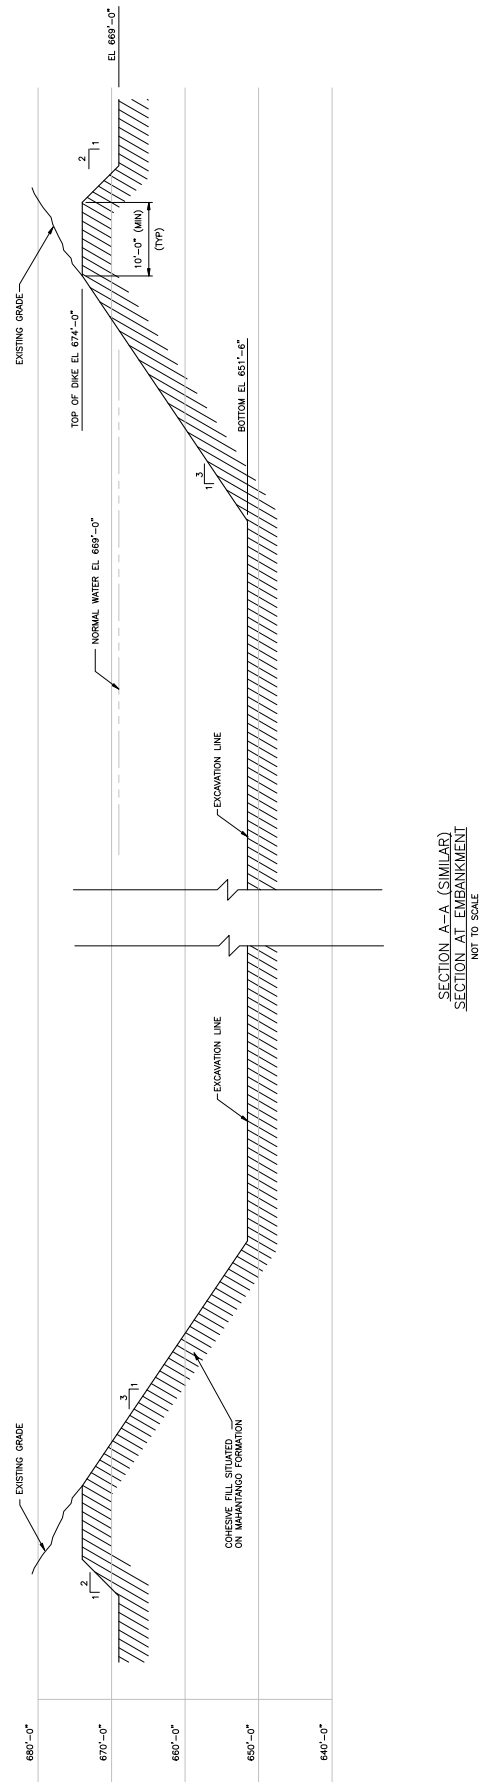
{Plant Arrangement - ESWEMS Retention Pond Section at Embankment}
